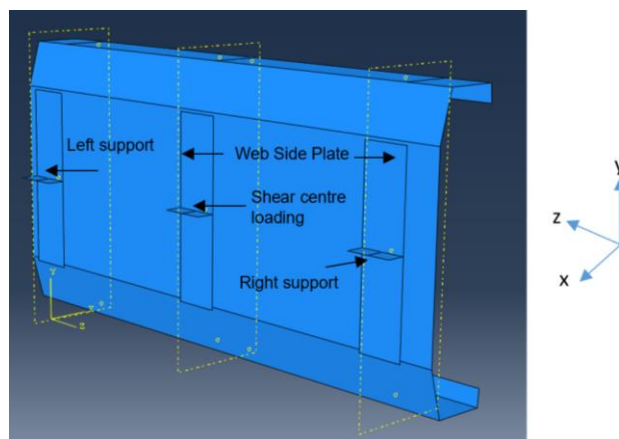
FE model of the folded-flange beam (Prototype 5) subjected to shear failure
